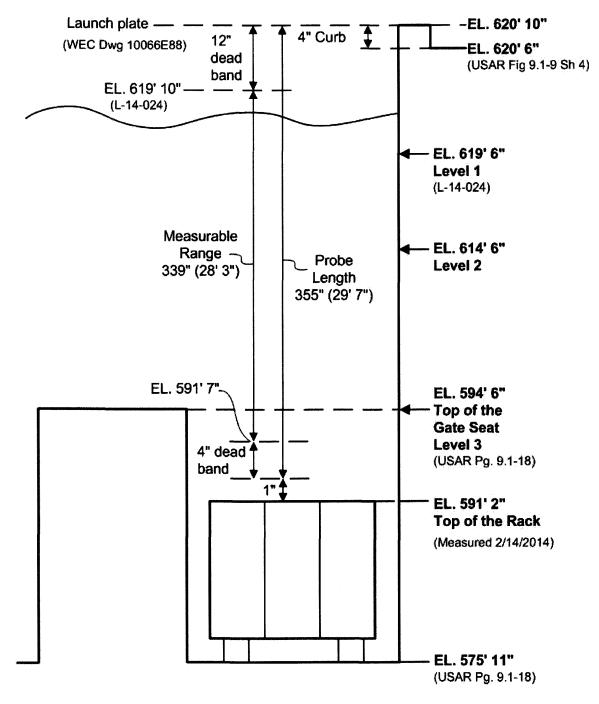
Elevation view of the SFPLI channel sketch.
